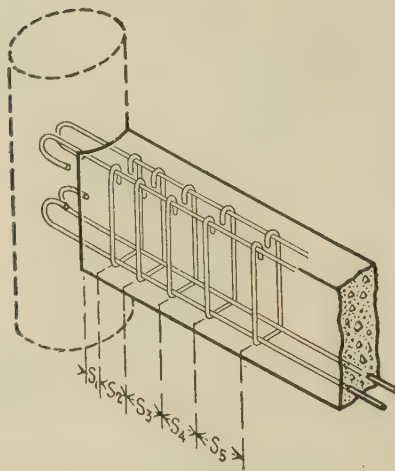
Typical Reinforced Concrete Beam with Anchored Longitudinal Bars and Vertical Stirrups.
